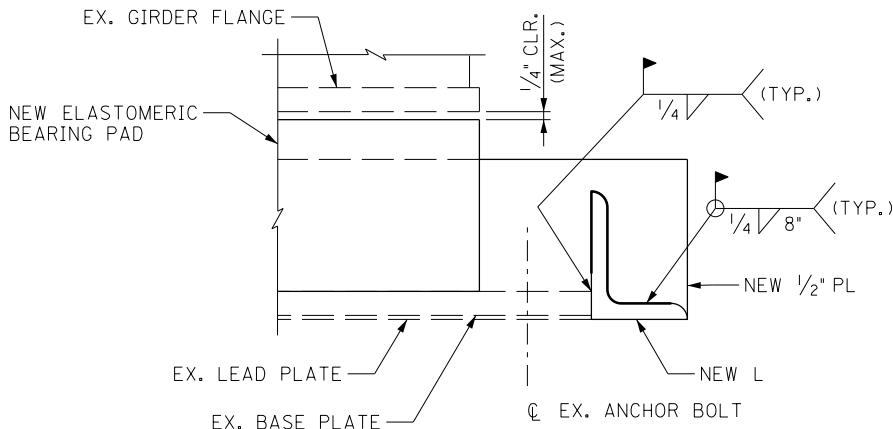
PIN & HANGER RETROFIT PLANS, SHEET 15.
